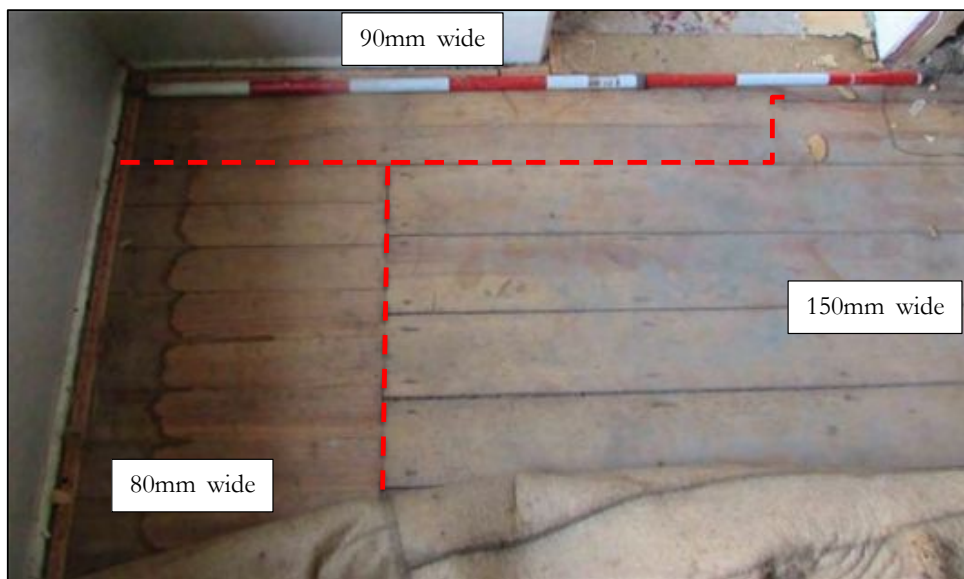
Photo of sample area 18C showing location different floorboard widths within Room 18 as indicated by red dashed lines (photo facing west).
